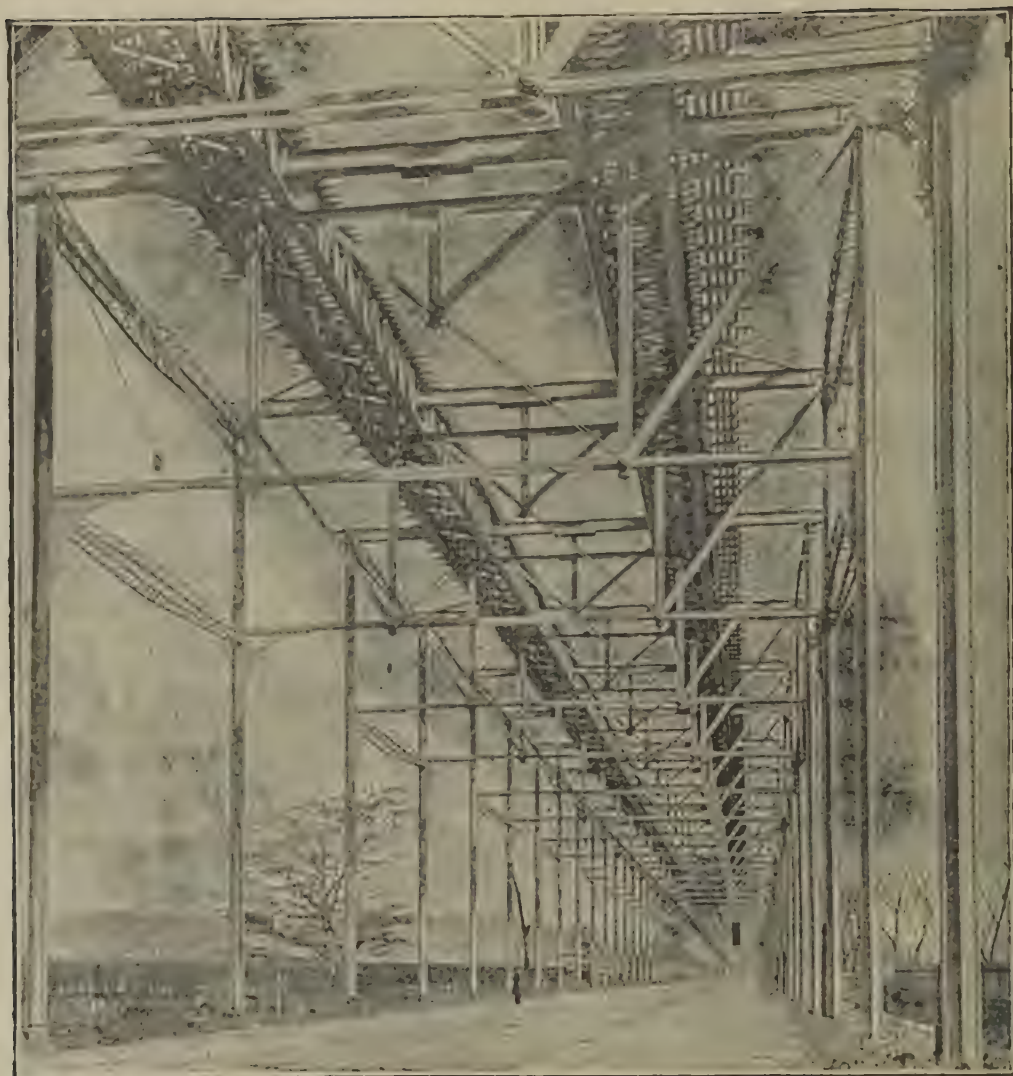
MANHATTAN ELEVATED—EIGHTH AVENUE AND 111TH STREET.
